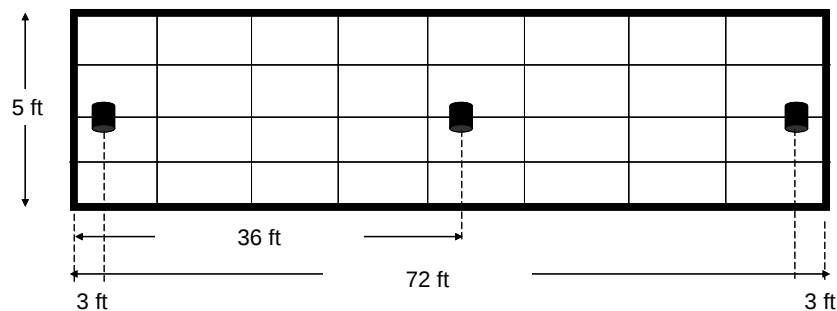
A Line Diagram Depicting the Sensors Installation Plan for Drilled Shafts
